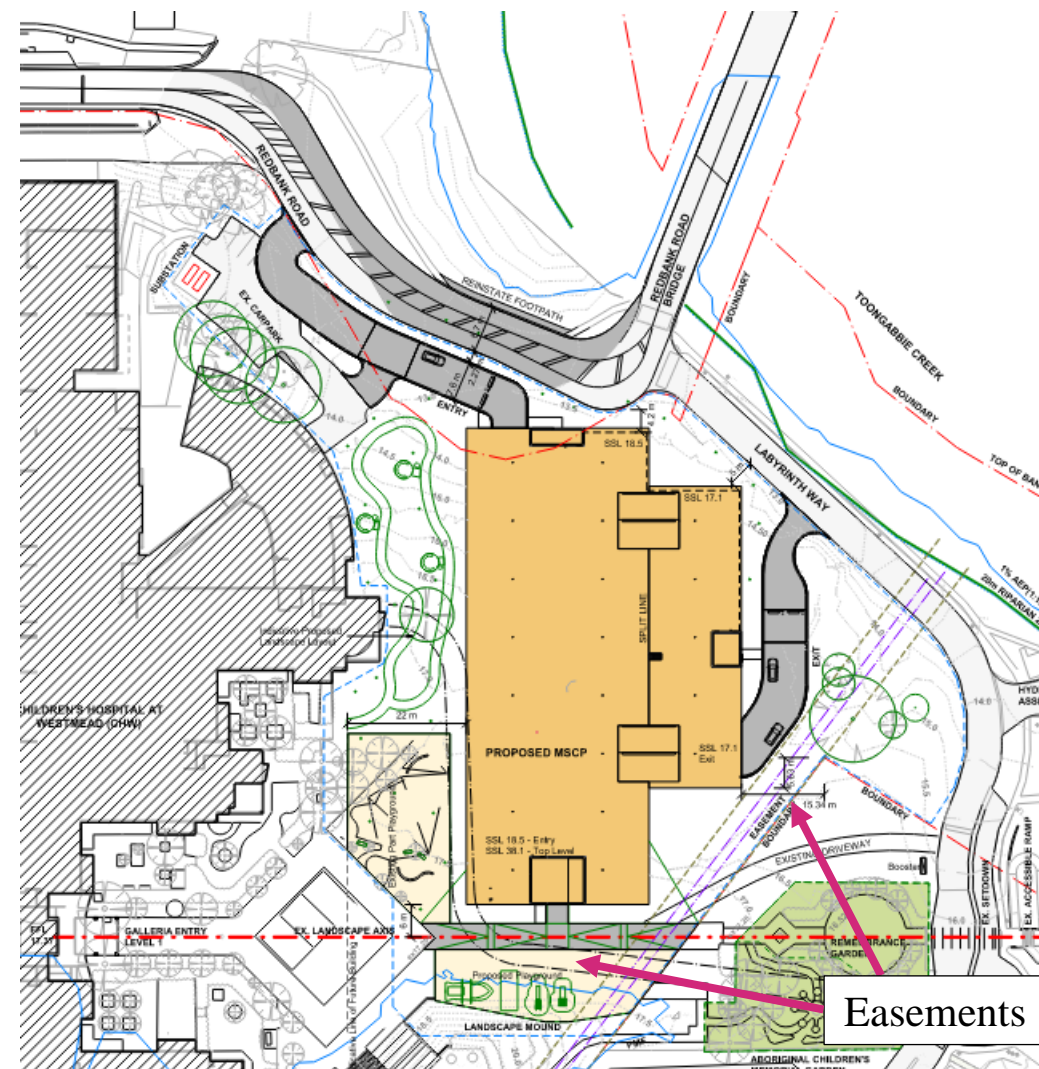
MSCP Architectural Site Plan (Source: BLP dated 14/12/20)
